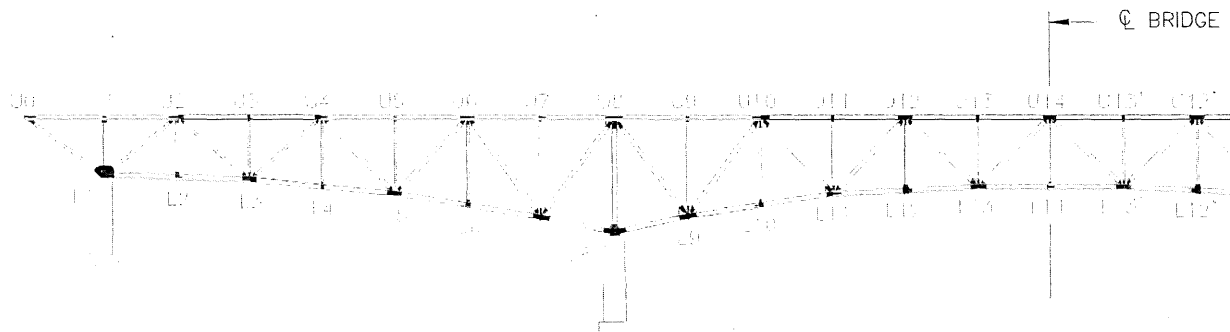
Reinforcement plate retrofit locations proposed by URS (retrofits symmetric).
